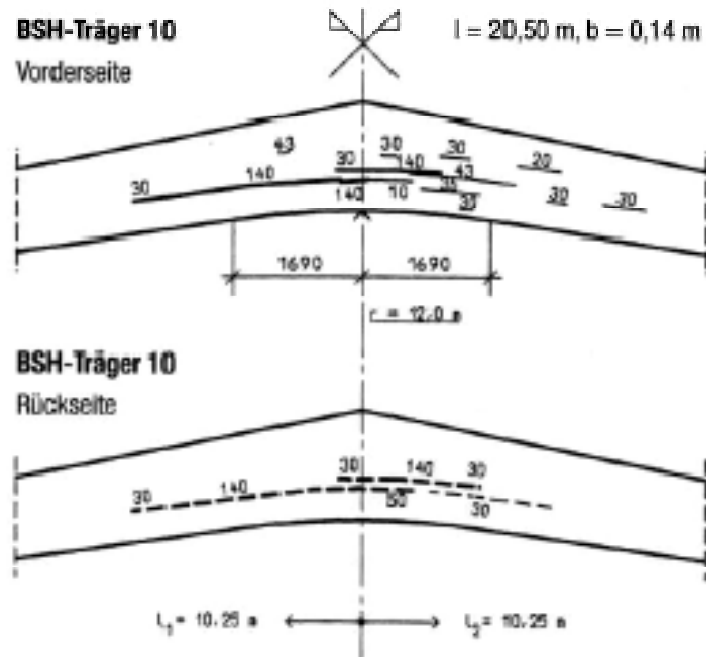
Cracks in pitched cambered roof beams due to restrained shrinkage. Views of both sides of a beam. Source: Ref. [7].
